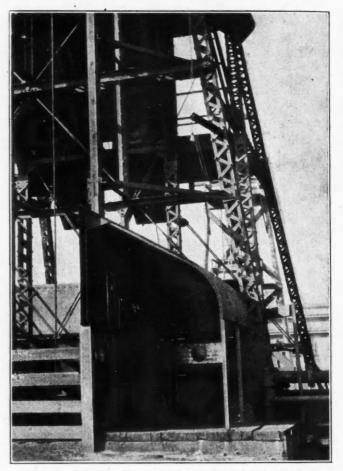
LADDERWAY HOUSING AT SHAFT COLLAR
